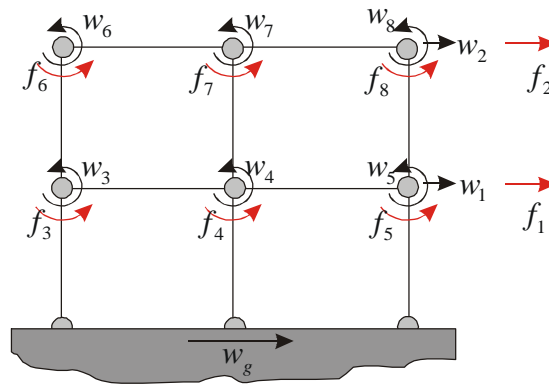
Typical plane frame structure without axial deformation of structural elements
